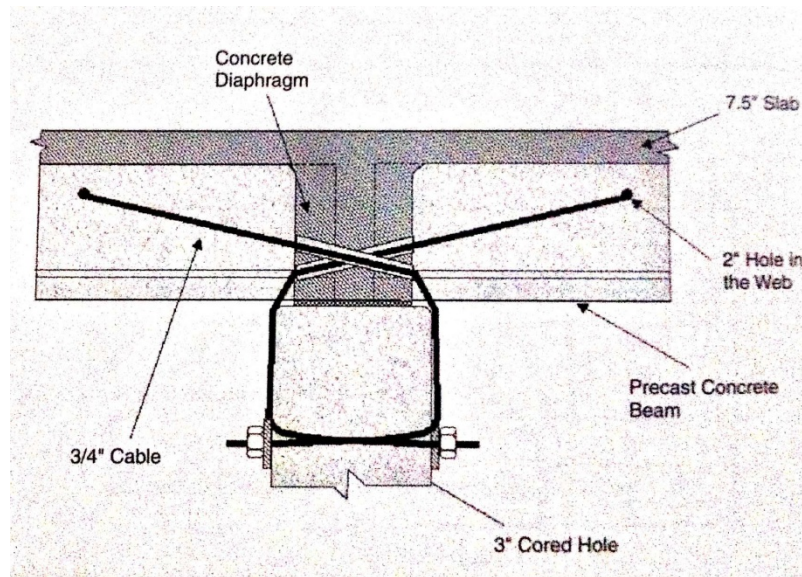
Precast girder and cap beam restrainer (Source: Yashinsky and Karshenas, 2003)
